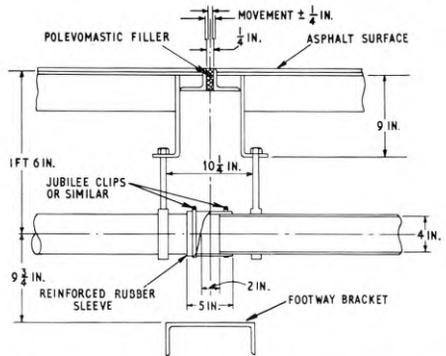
EXPANSION JOINT FOR DUCTS TO ACCOMMODATE MOVEMENT BETWEEN DECK SECTIONS OF FORTH ROAD BRIDGE
